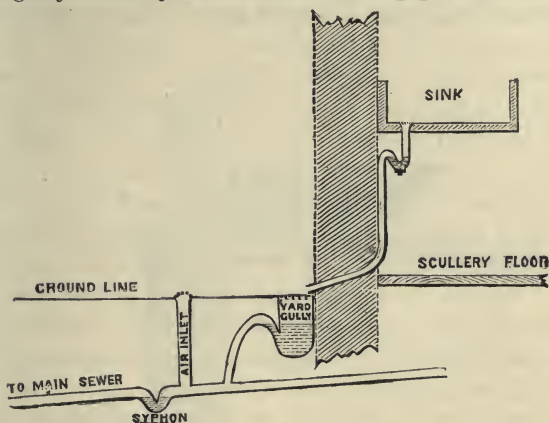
Waste Pipe of Sink, provided with S-trap and discharging over Yard Gully. House Sewer provided with Syphon Trap and Air Inlet.
